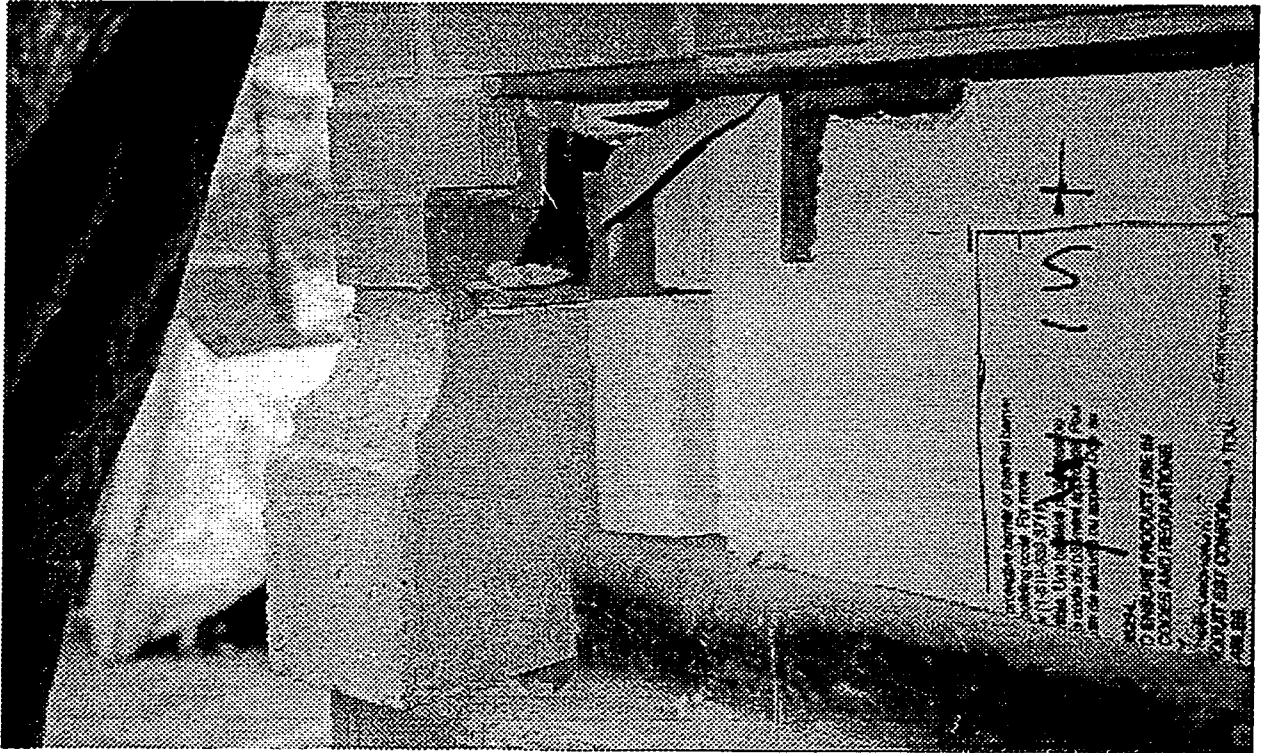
Shelf angles installed 135 mm higher on southern elevation of Building A.
